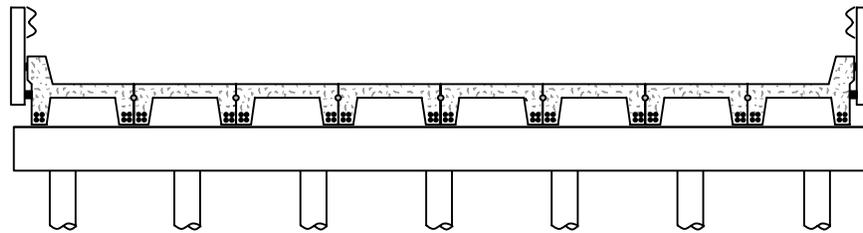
Typical PCB Cross-Section near Abutment (Roadway Crown not Shown)
